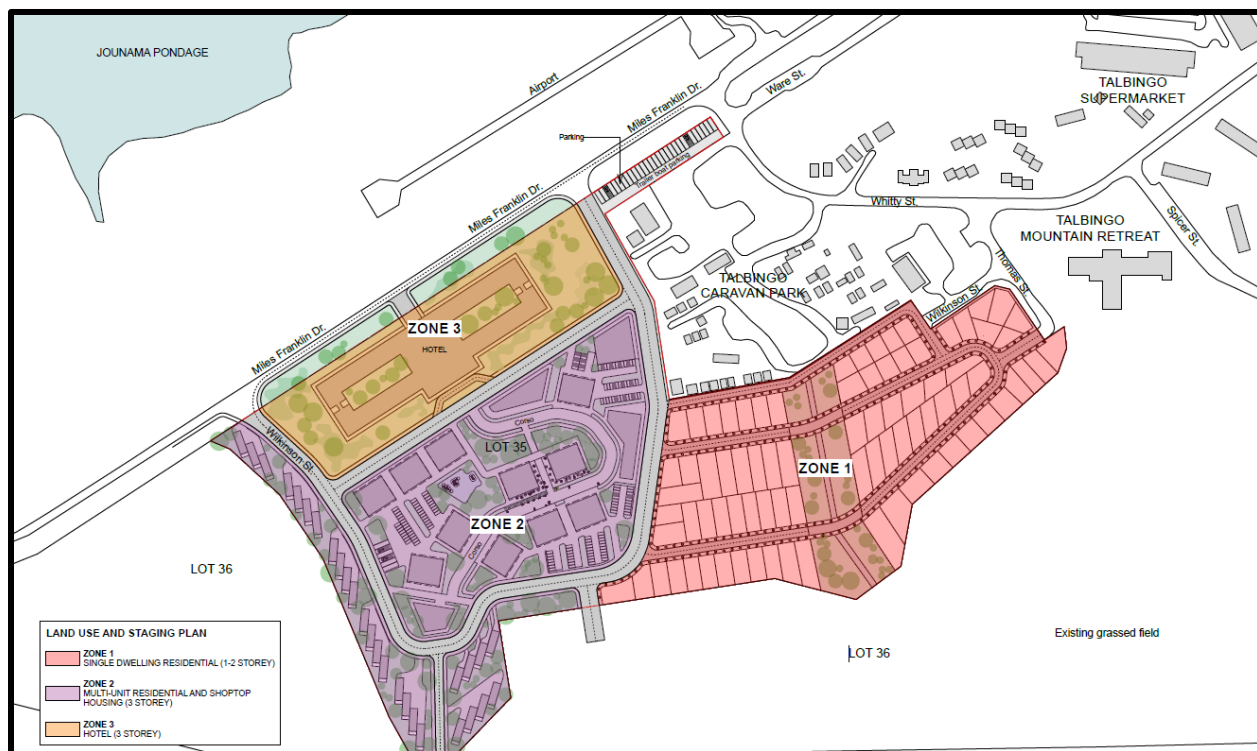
Staged Precinct Masterplan (Source: West Talbingo Village Masterplan – Robert Harwood Architects)
